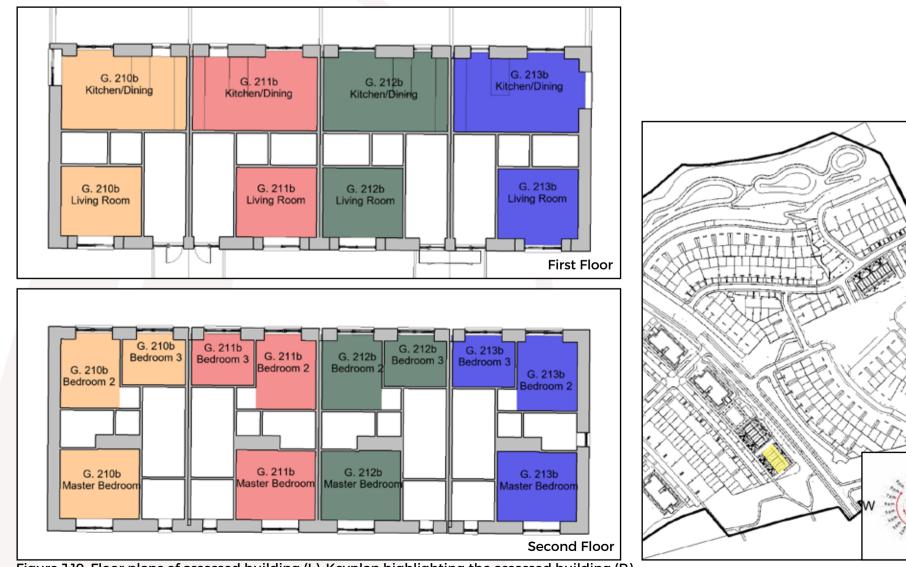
Floor plans of assessed building (L), Keyplan highlighting the assessed building (R).
